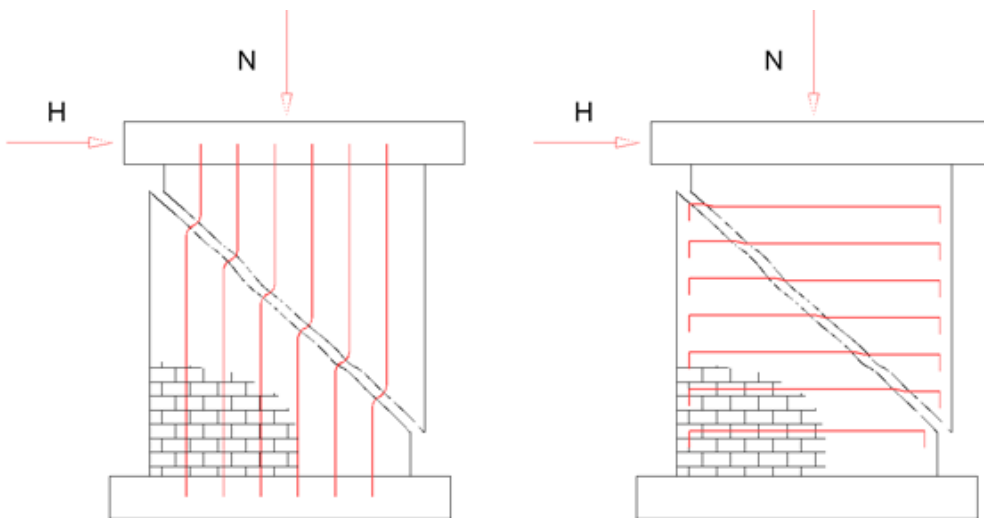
The mechanism of action of vertical and horizontal reinforcement of a masonry wall failing in shear [65]
